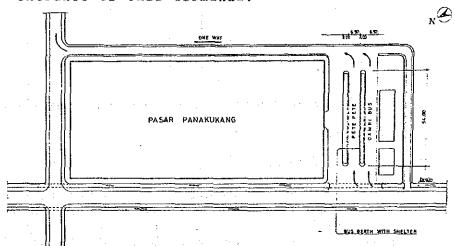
Pasar Panakkukang Sub-Terminal Improvement Plan
